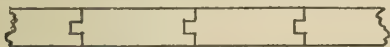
Modern tongued and grooved floor boards, each board having a groove on one edge and a tongue on the other
